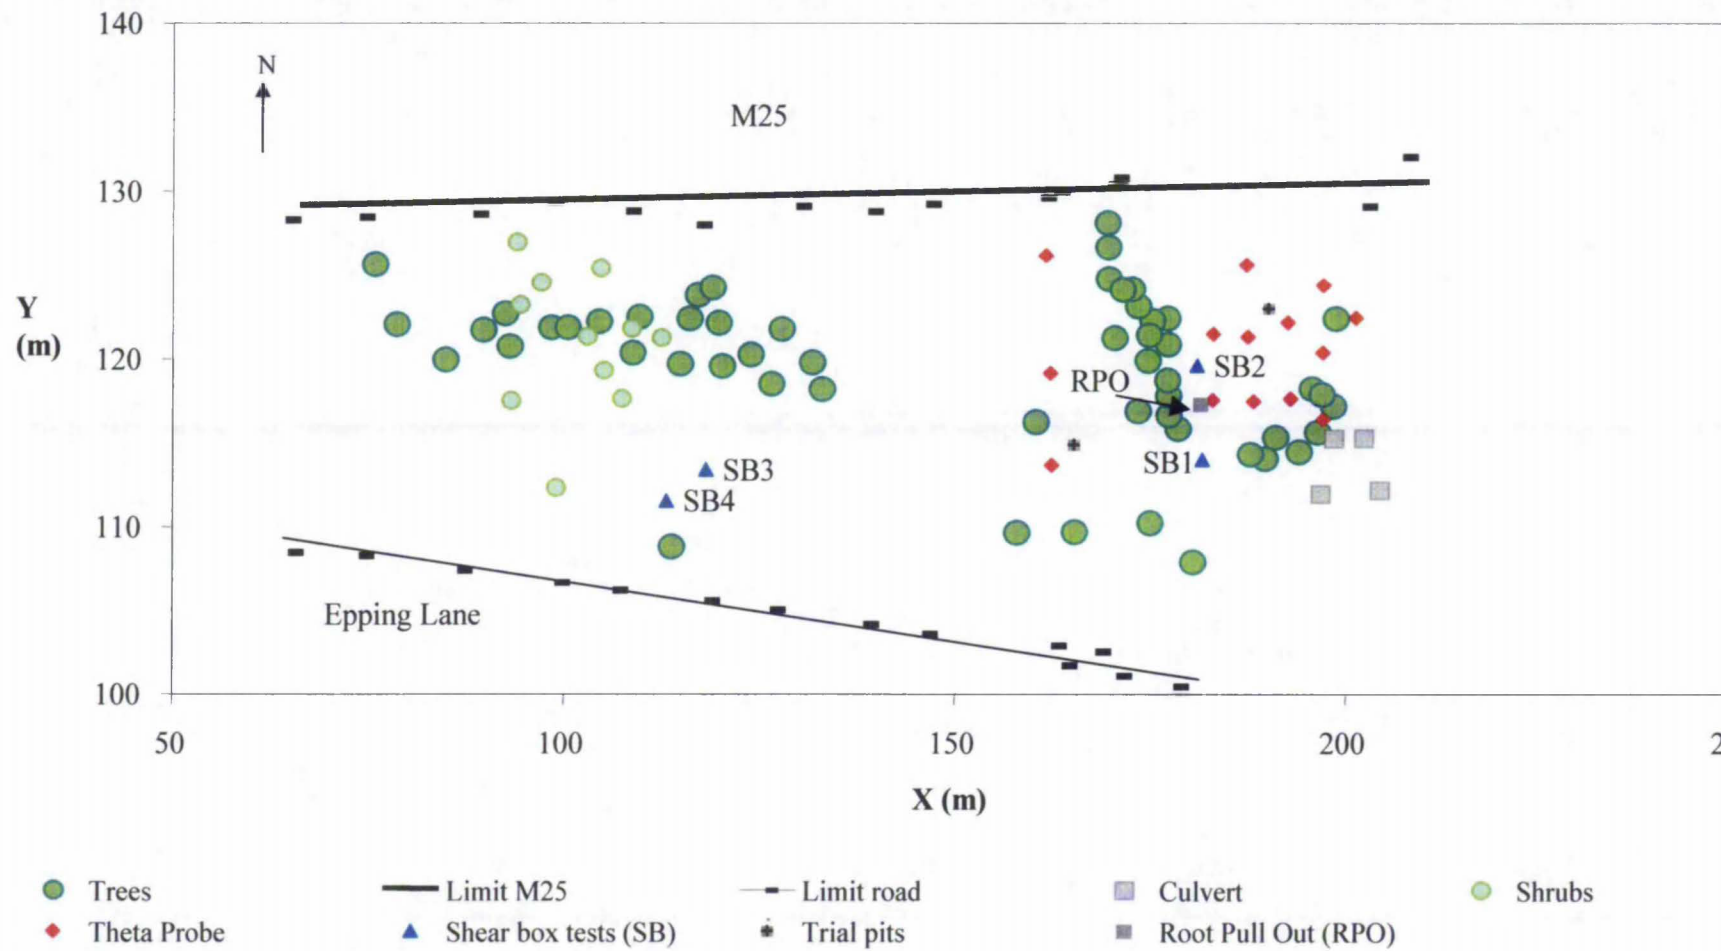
Layout of Site 1 the M25 embankment, including positions of shear box and root pull out tests (modified from Anon, 2004).
